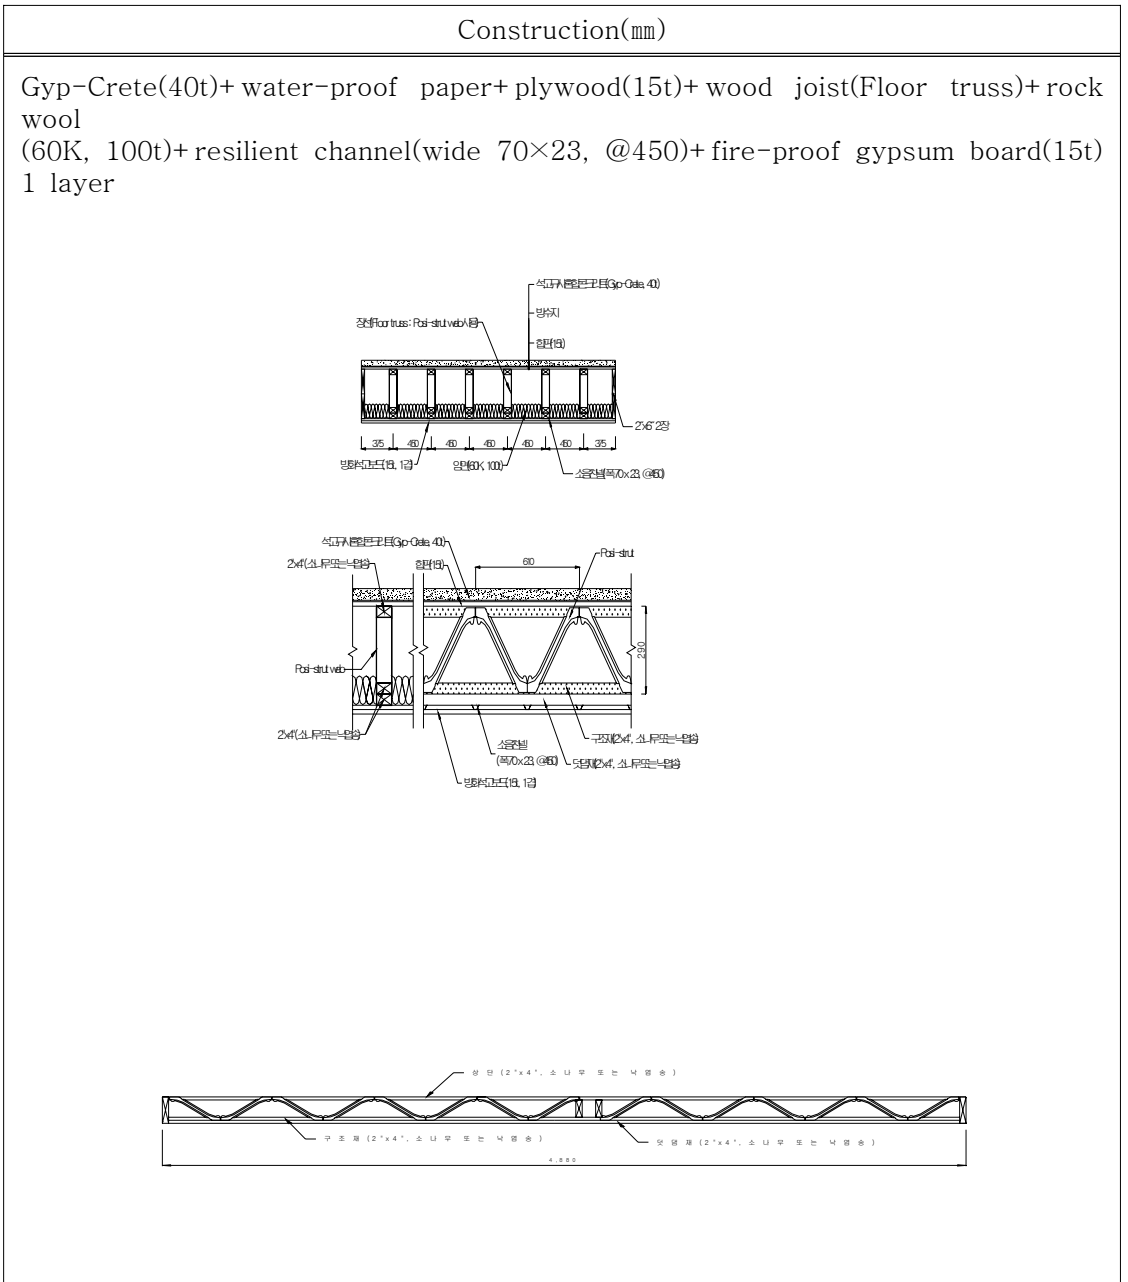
Specification of floor of light-frame wood structure by Korean softwood structural lumber(Floor truss)
